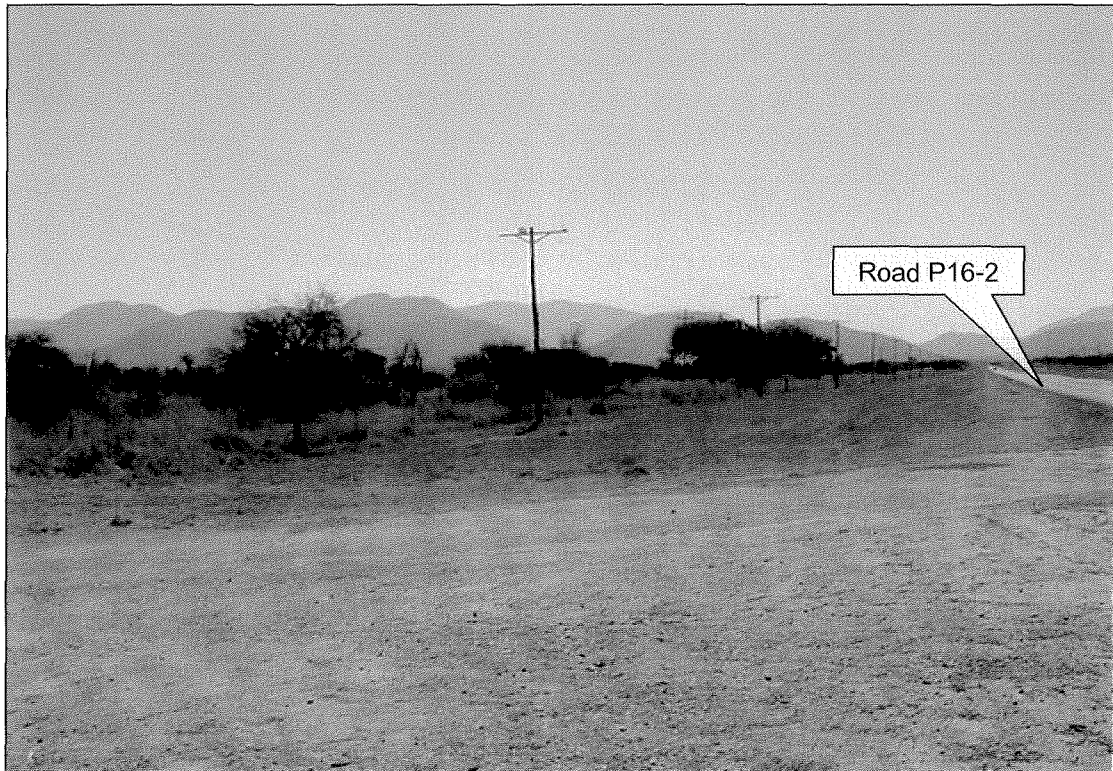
Road P16-2 borders the application property. Access to the development will be obtained from this road at a single access point.
